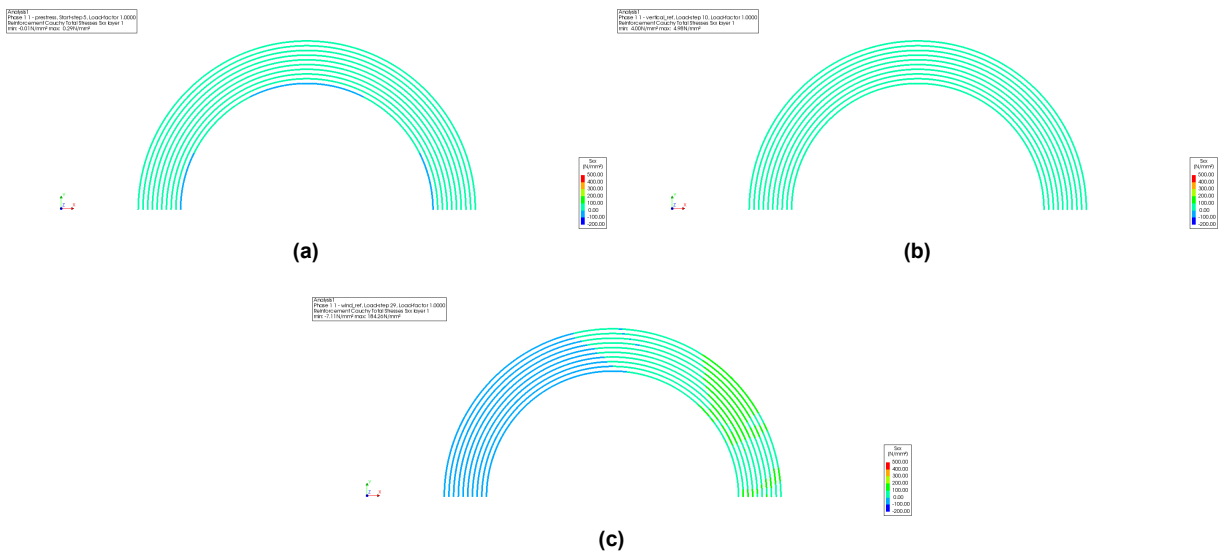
Steel stress in the Bottom tangential rebars a) After prestress, b) After vertical load, c) After wind load
